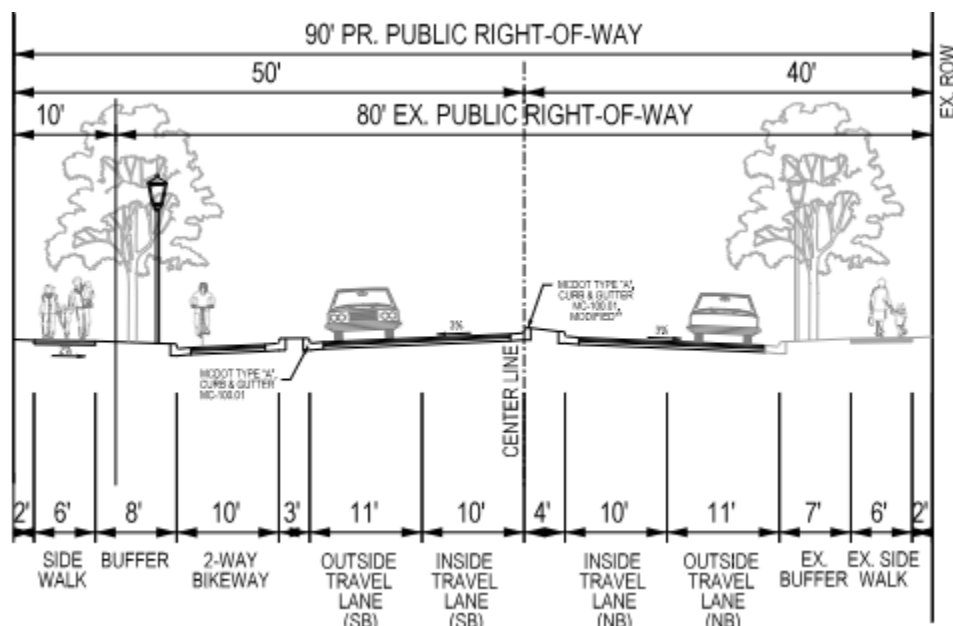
Proposed Cherry Hill Road Cross-Section, approximately 660 feet north of the FDA Boulevard/Cherry Hill Road intersection
